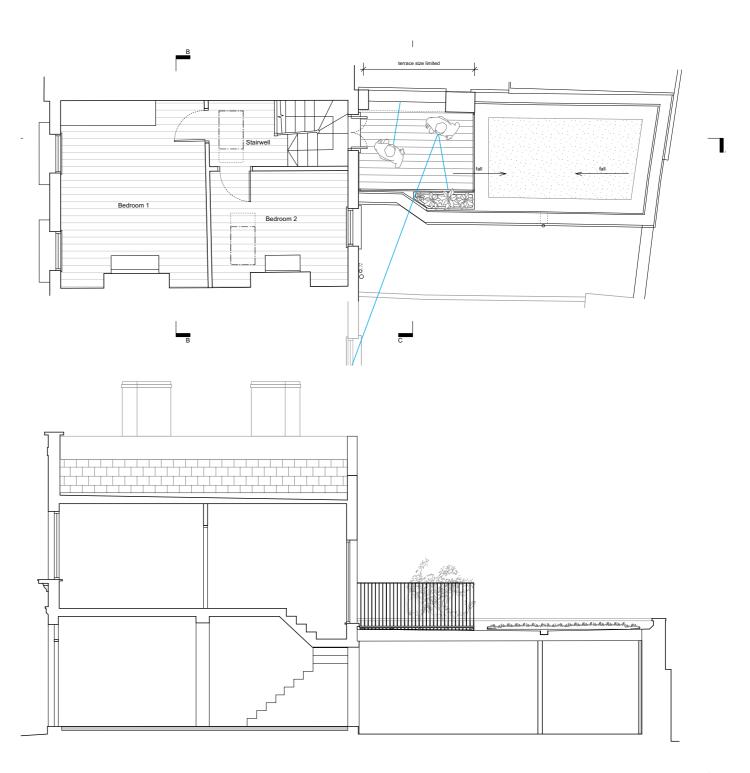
R+ S As Proposed First Floor Plan, As Proposed Section AA - Proposed location of green roof
